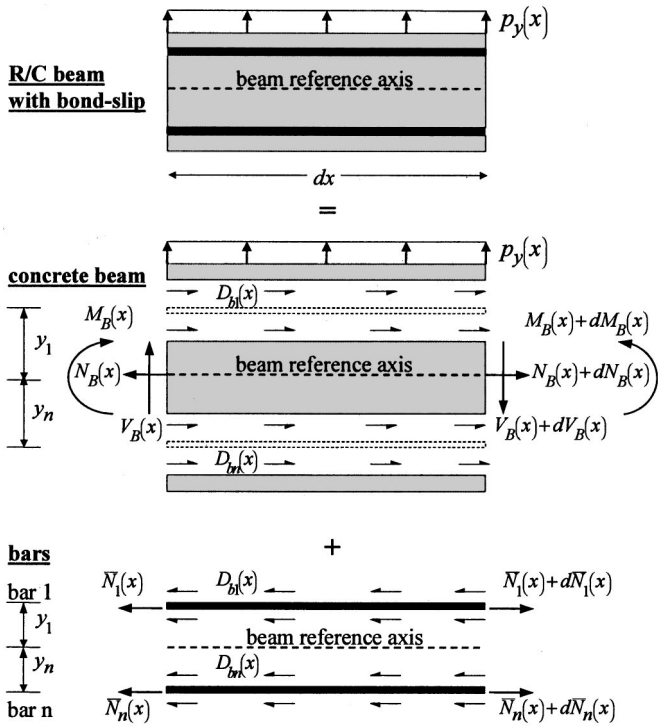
Reinforced concrete beam element with bond slip: beam and bar components
